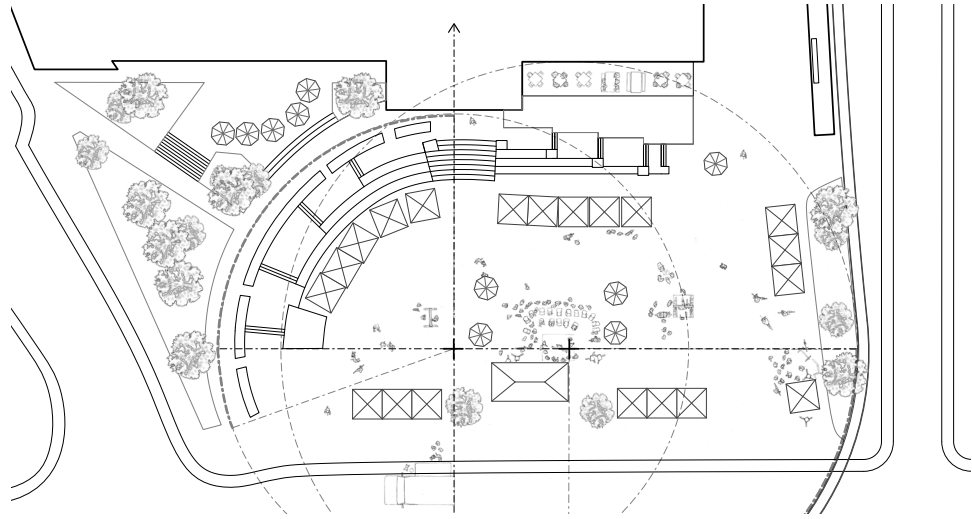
Waterloo Public Square Open Streets Event September 2017 site plan.
